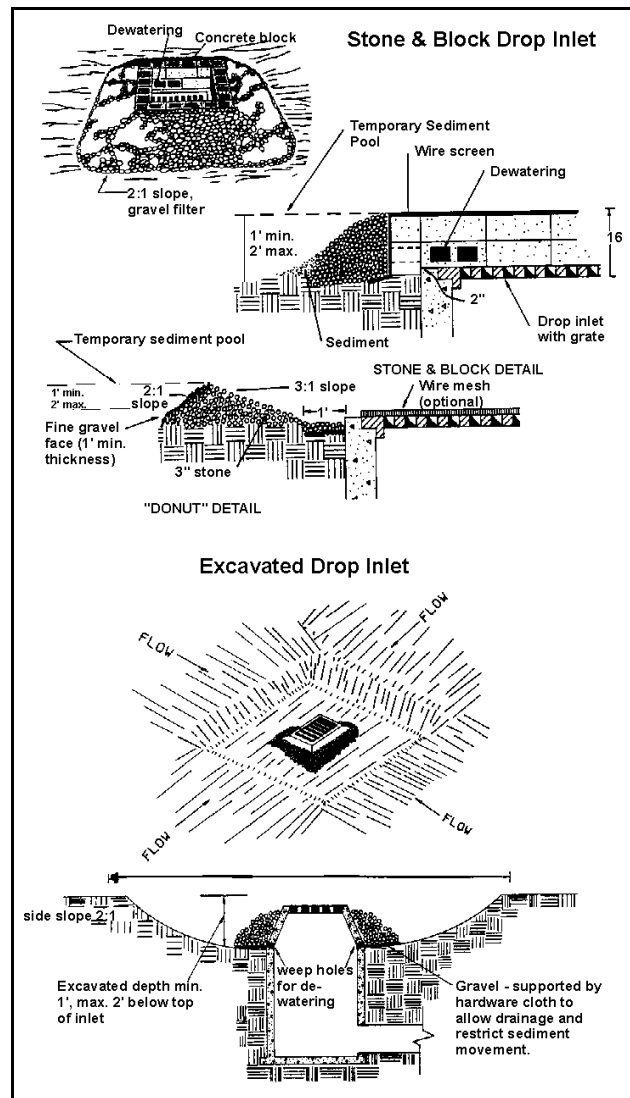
Examples of stone and block inlet and excavated drop inlet storm drain protection (*Empire State Chapter, Soil and Water Conservation Society, 1997*).
